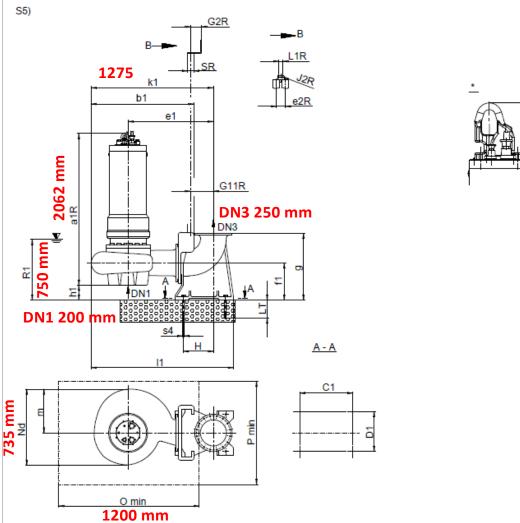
General arrangement drawing S5, stationary on duckfoot bend, guide rail arrangement, single-level foundation, without foundation rail, small upper holder, motor version N
